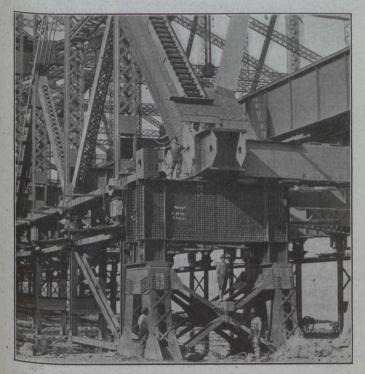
Lower Supporting Girder at XL0 Joint Resting on End Bent
